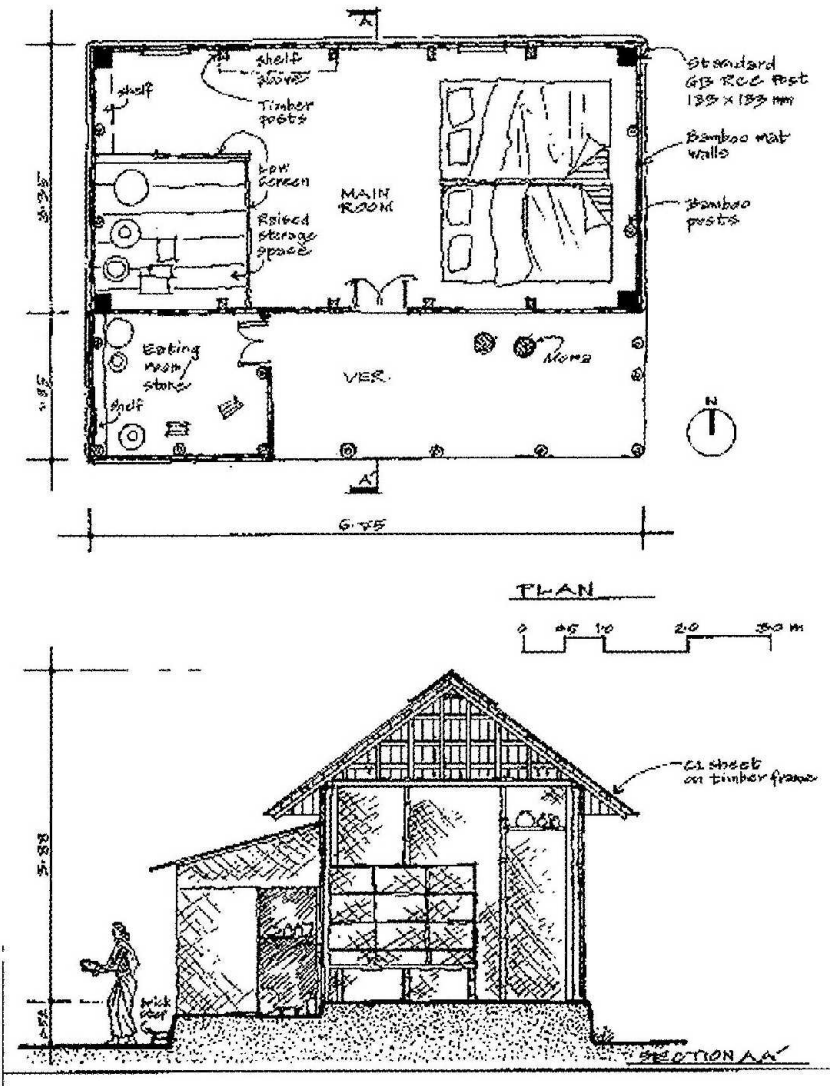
Naz Jahan's GB house (note the four corner posts and the raised platform)
